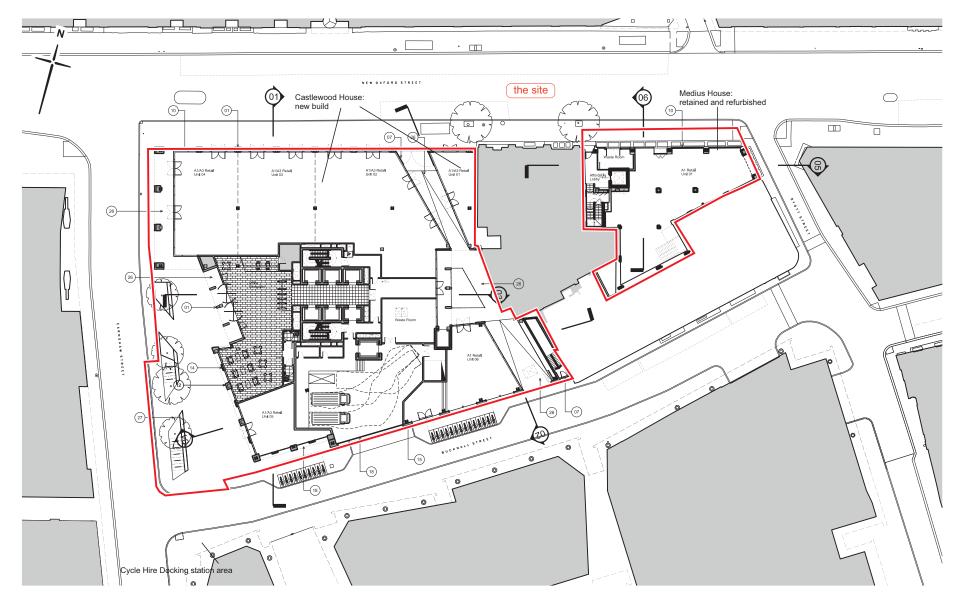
Plan of proposed ground floor level (new build and retained) (Robin Partington & Partners, dwg. no. A_PL_P_100)
